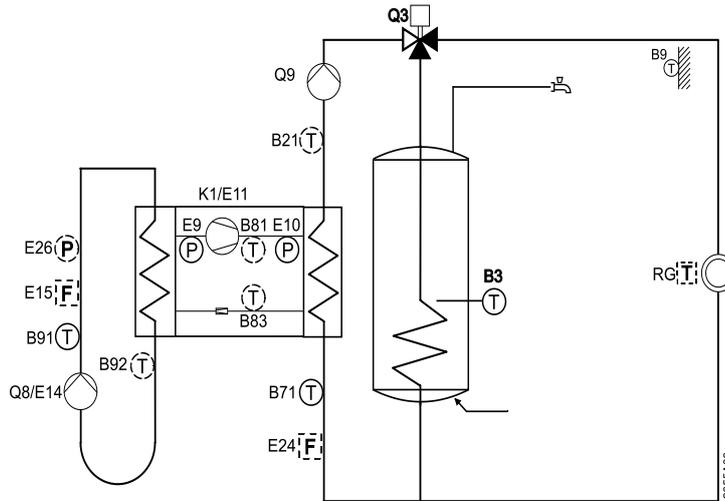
DHW storage tank and space heating without a buffer storage tank (additional storage tank)
